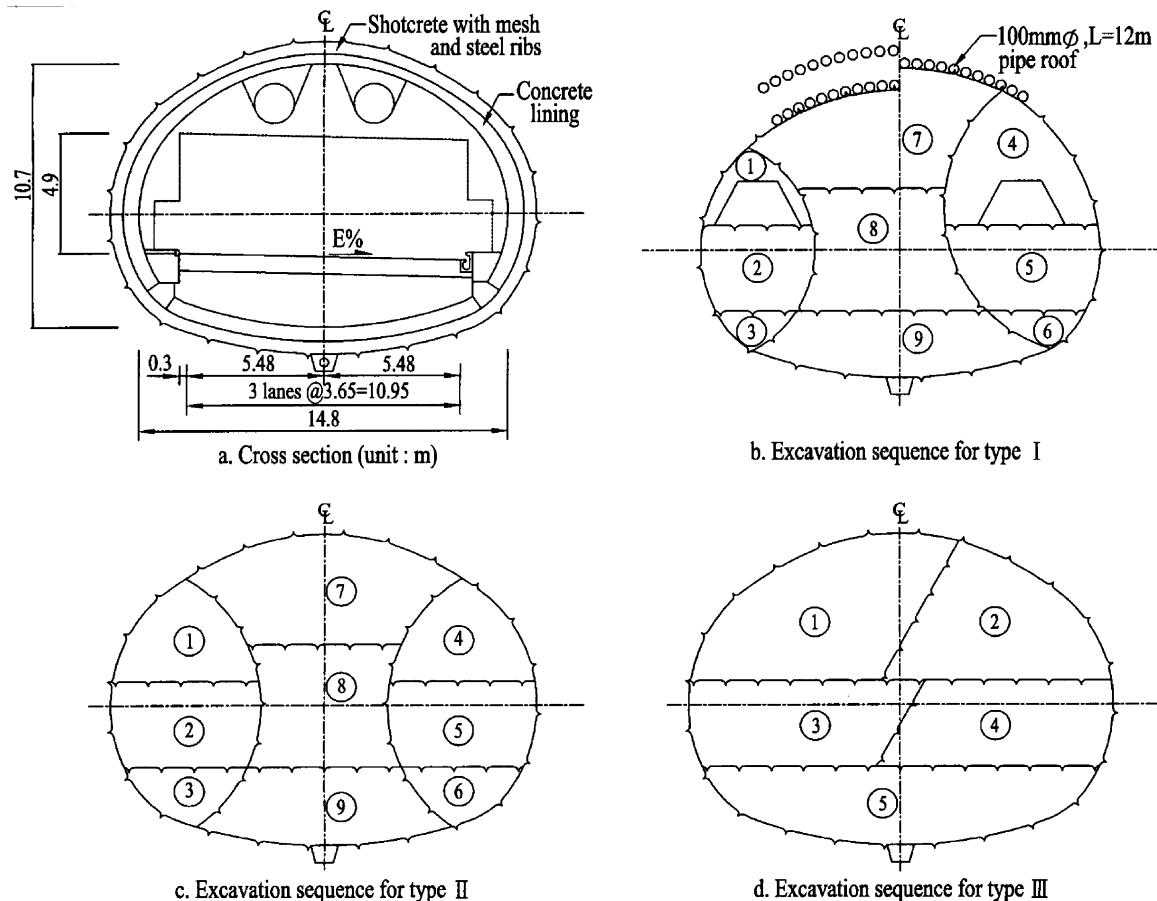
Cross-section and excavation sequence of Lantan Tunnel.
